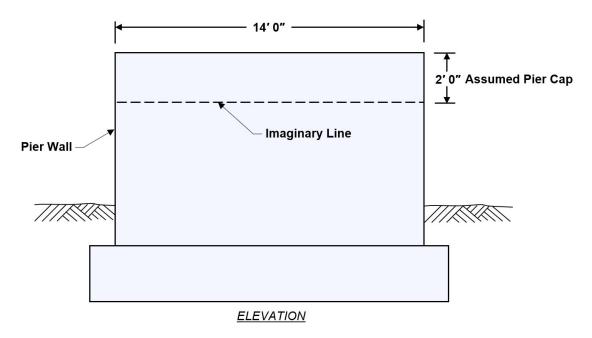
Elevation View for Reinforced Concrete Pier Wall Example
